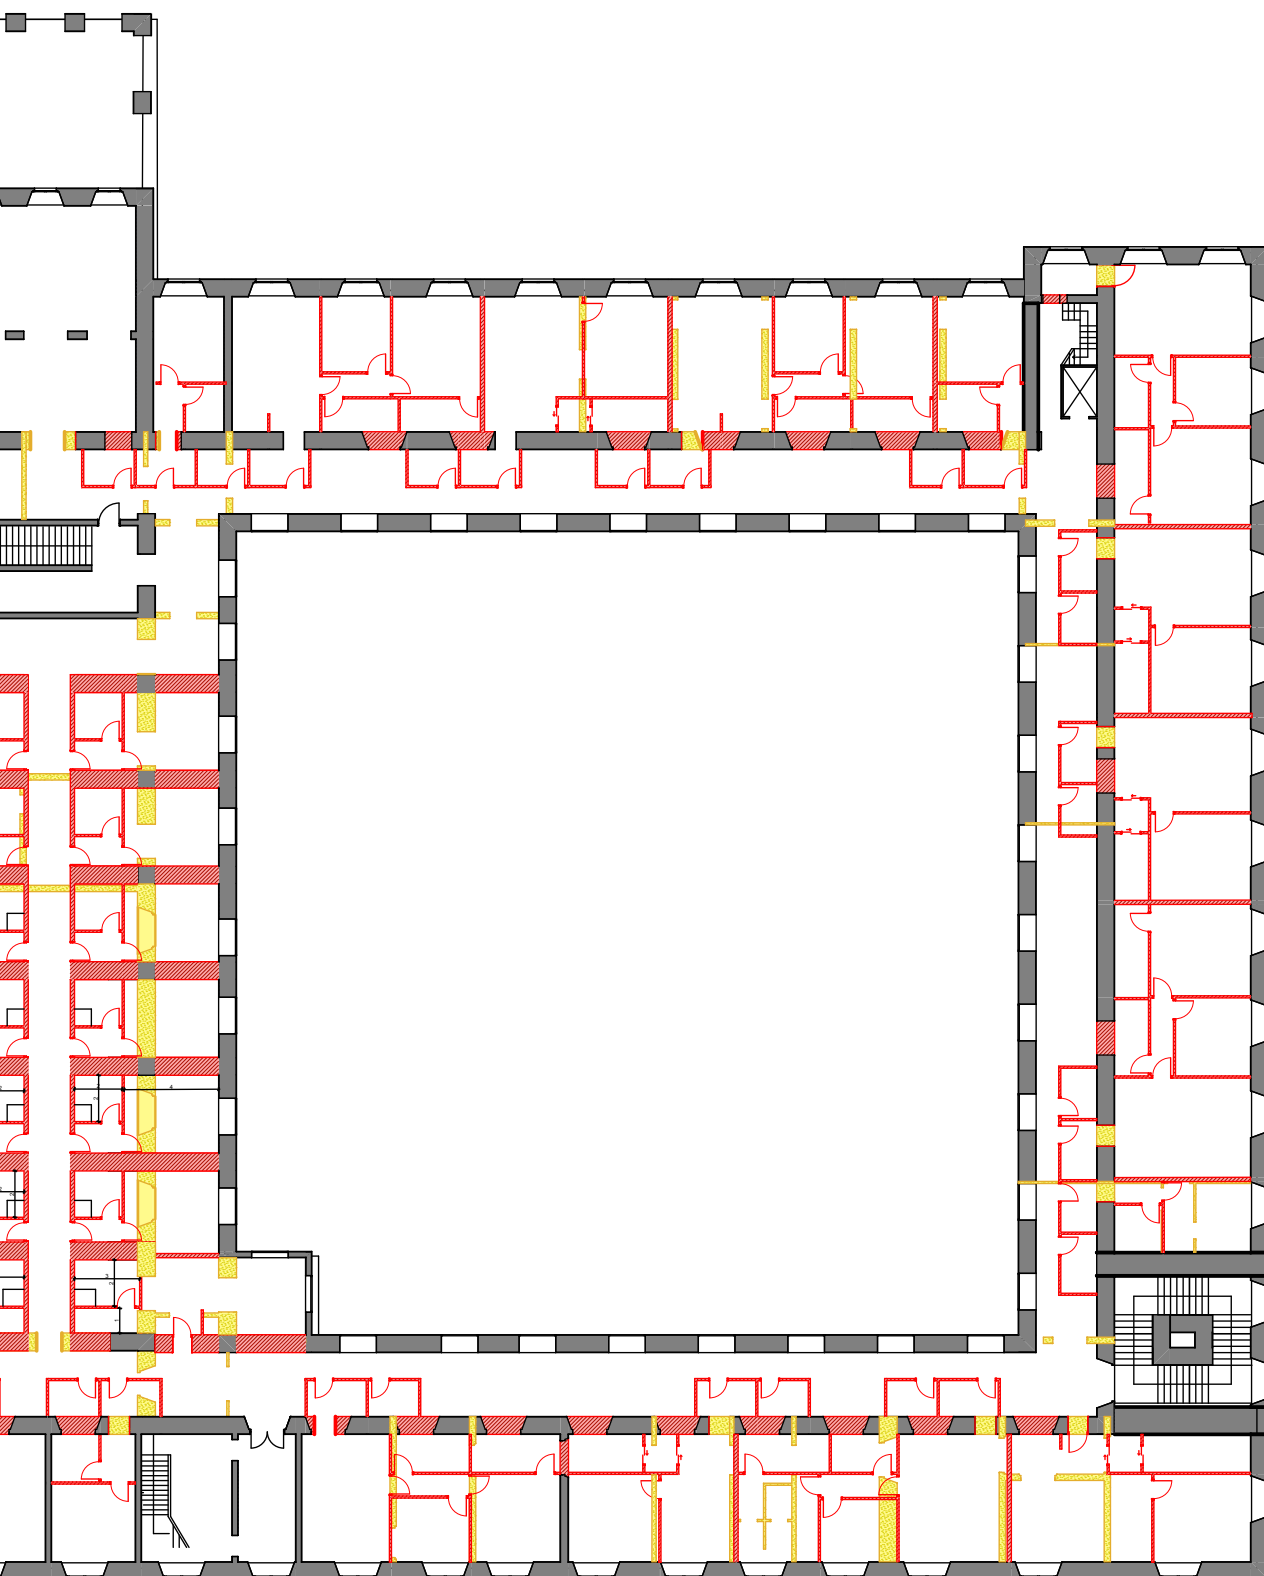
First floor plan of the Chiarugi Pavilion demolition and construction.
